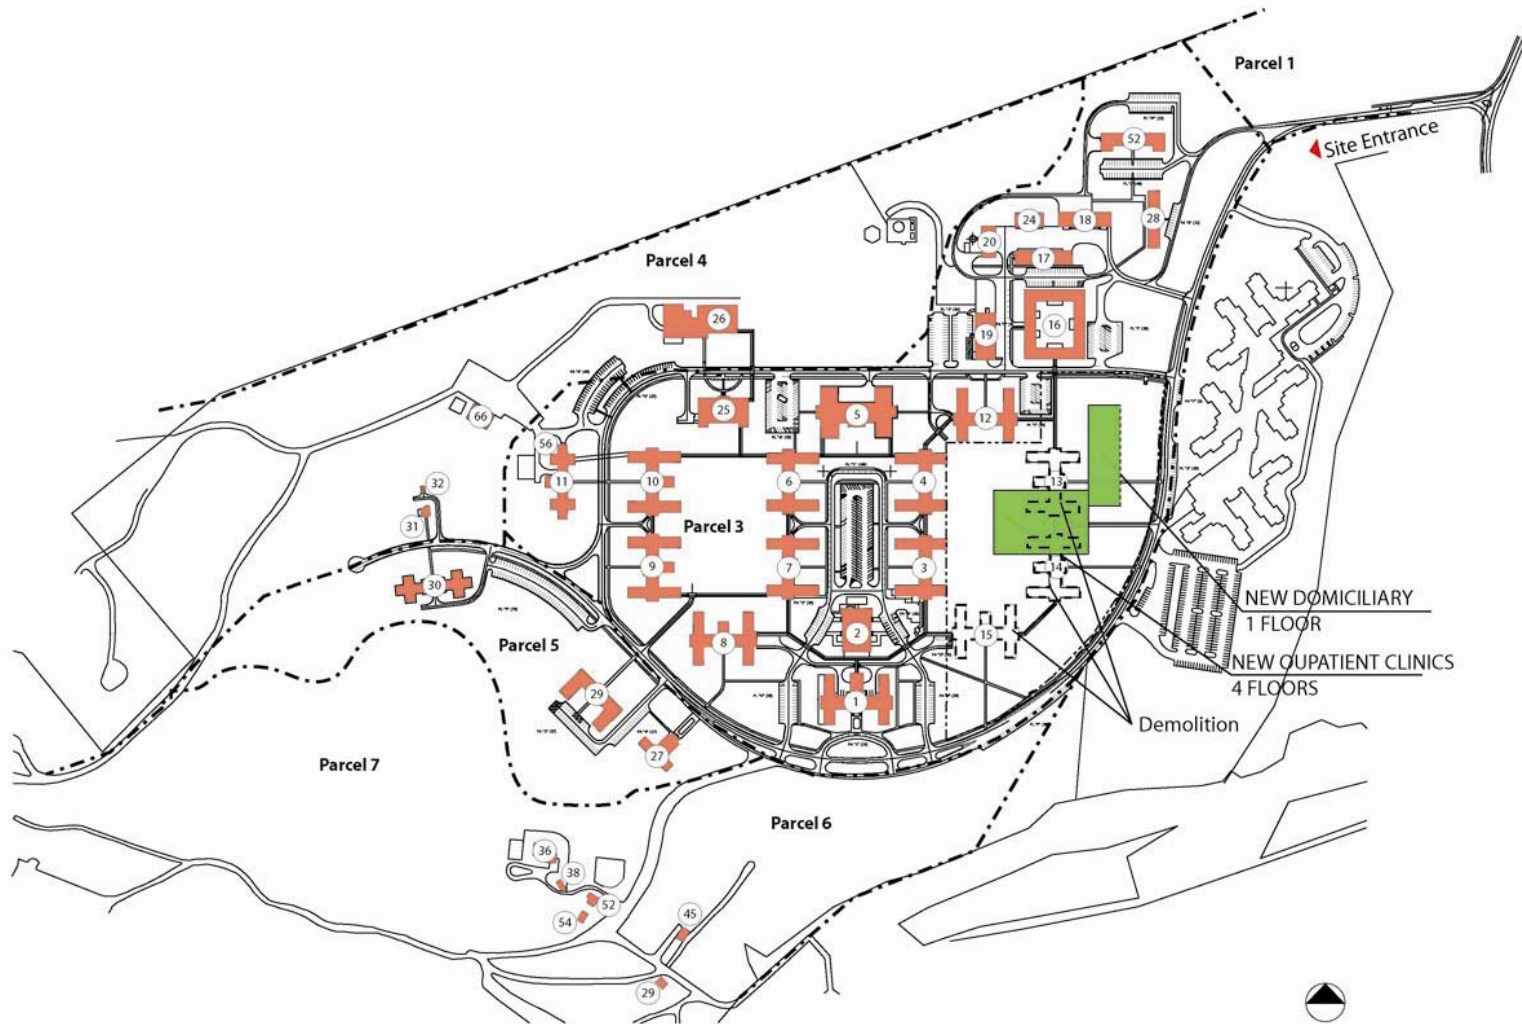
Proposed New Site Plan - BPO 5 (At Montrose, Construct New Domiciliary on Northwest Campus, New Ambulatory Care Facility North of Fire Station)
